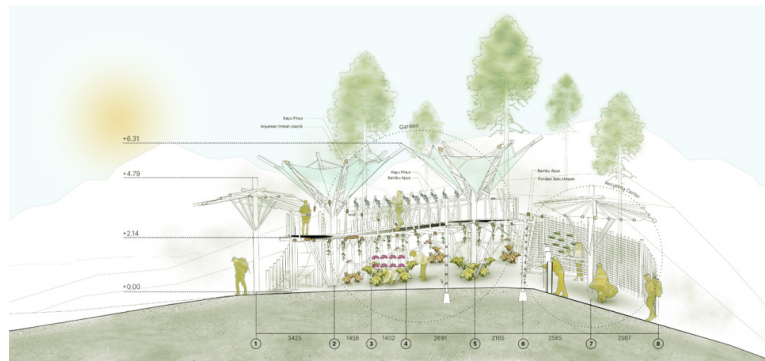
Example of low-tech design work with composed permeable walls and varied shading structure
